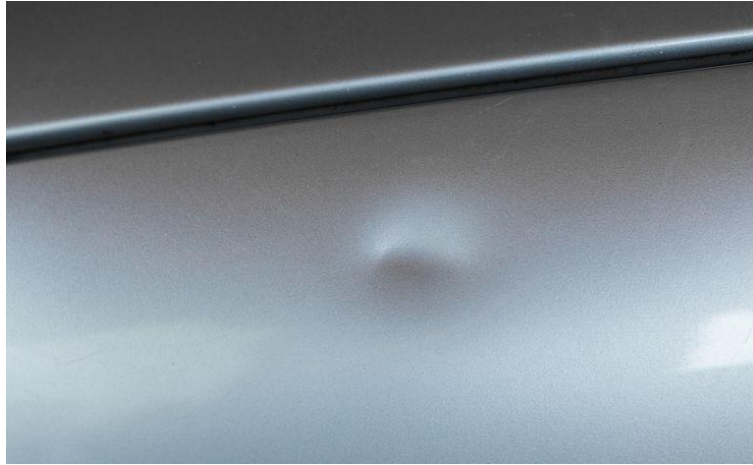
Showing a dent in the surface of a flat fabricated rainscreen panel
